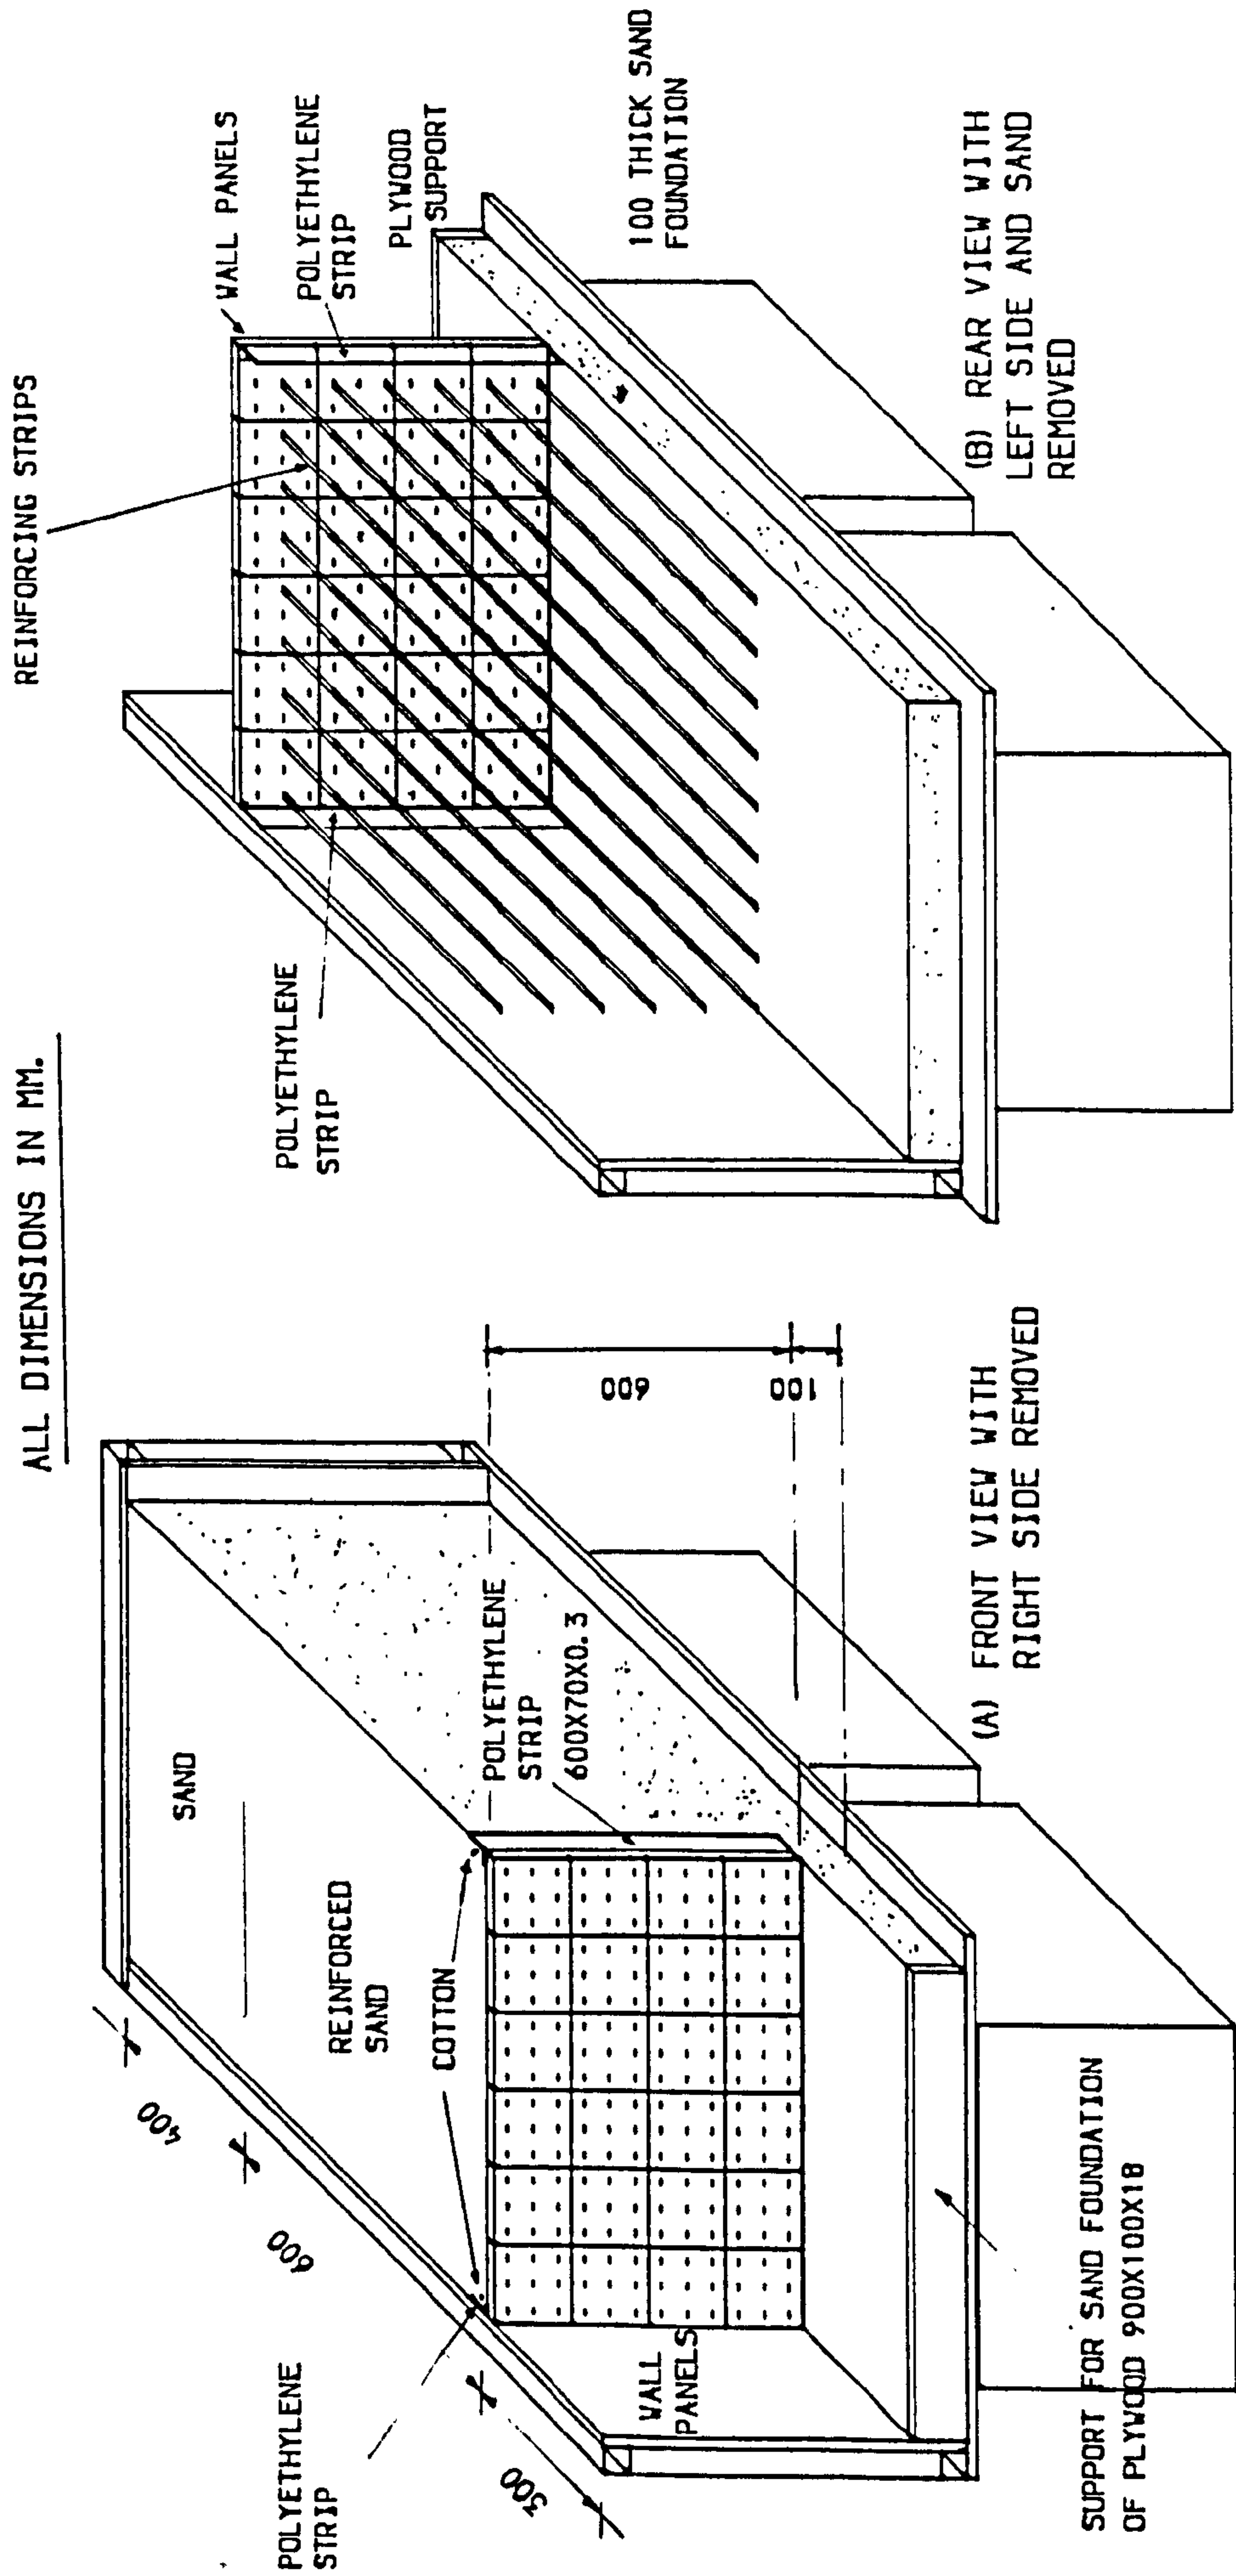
7) WALL FACE EDGES AND ASSEMBLING OF REINFORCED EARTH WALL.
